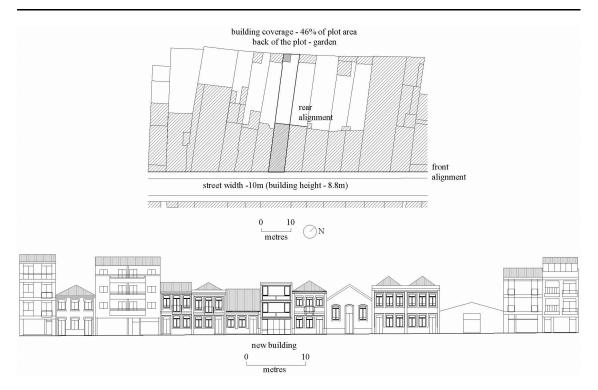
Plan and façades of part of Rua do Lindo Vale, Porto.
